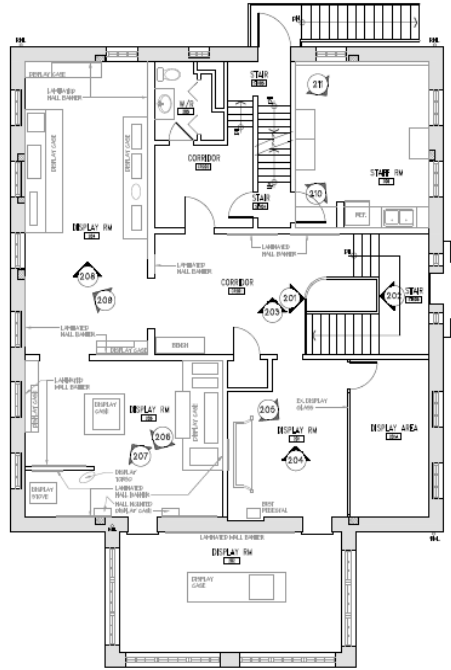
New Exterior Exit from the 2nd floor on the side of the building [85]
